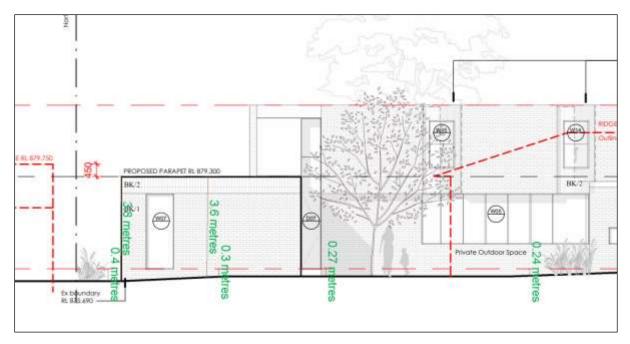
natural ground level (black line) and proposed finished floor level (red line)
